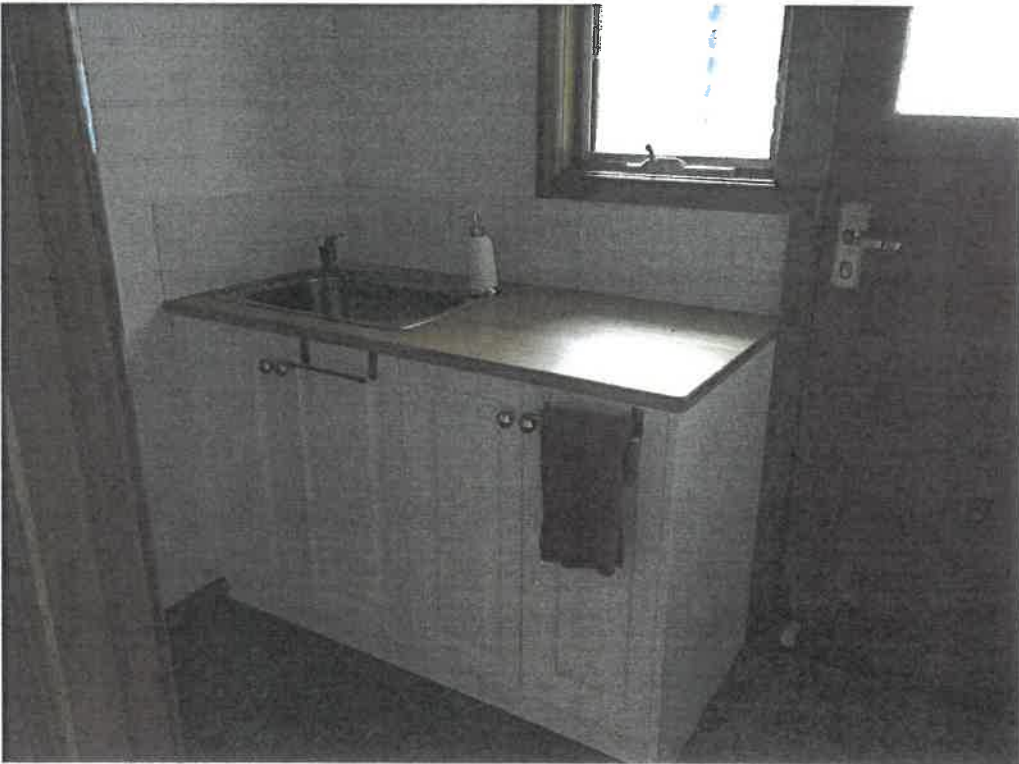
Willatook-Warrong Road Warrong 3282 sec137b report
